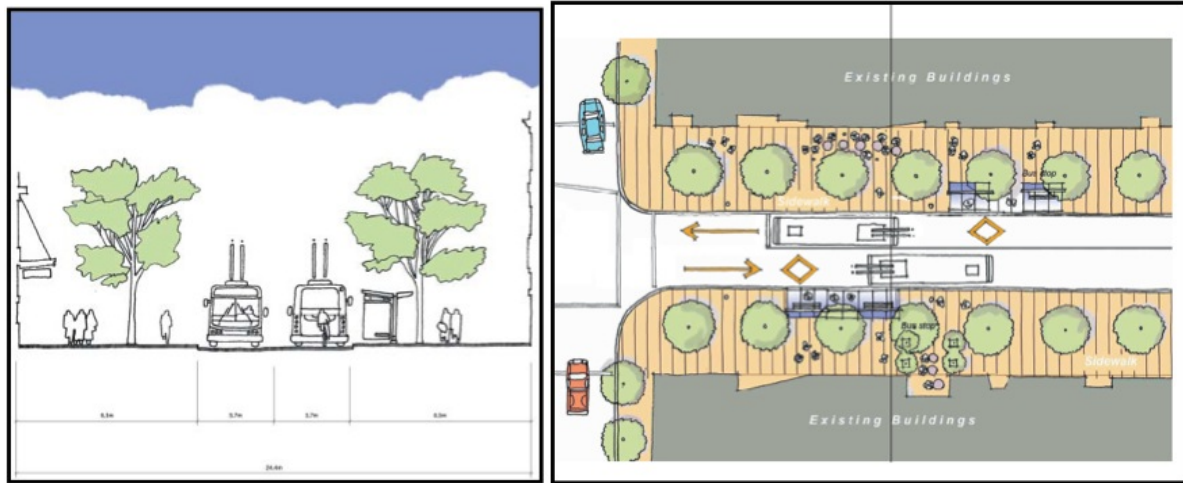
Enhanced Existing Concept - Cross section and typical block plan views north of Smithe Street (Source: COV, 2006)
